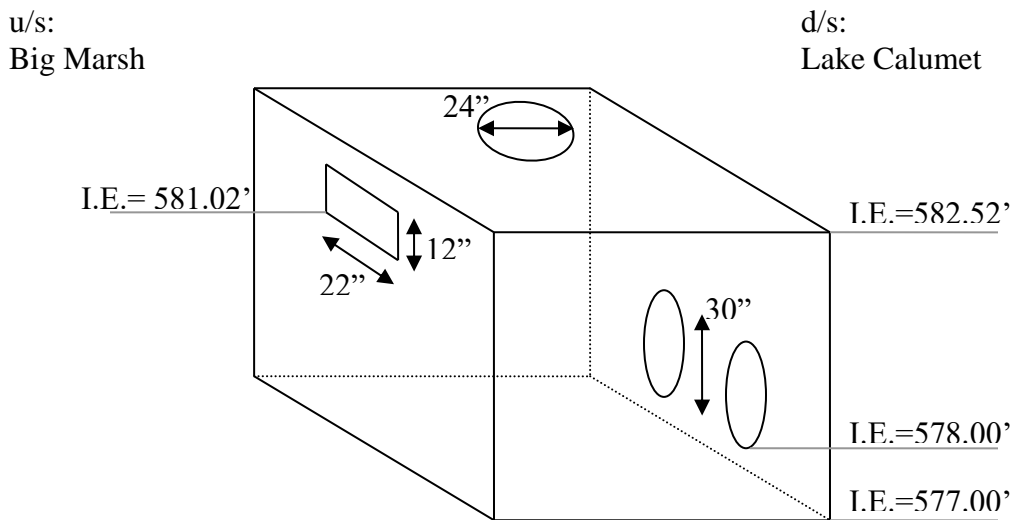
A drop inlet structure connecting Big Marsh to Lake Calumet (Structure 6).
